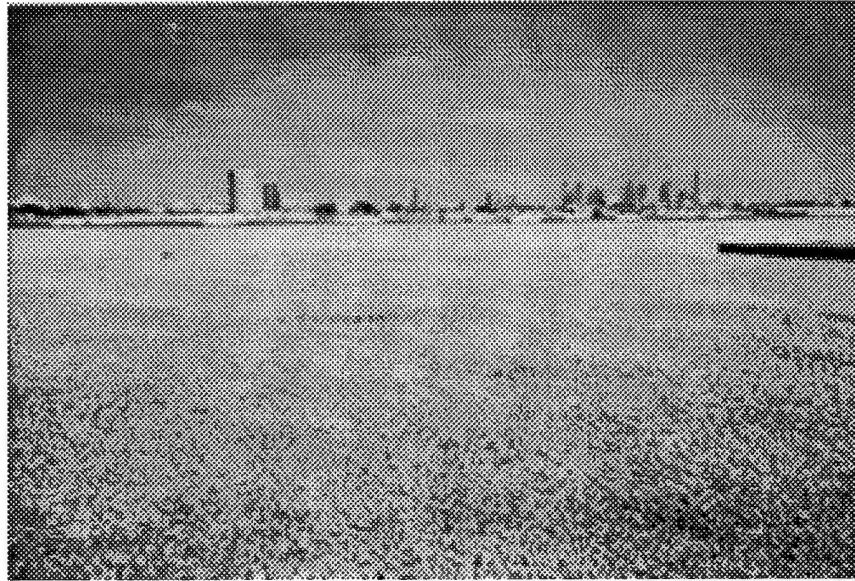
General view of roof D4 looking towards downtown Dallas (i.e., about southeast).
